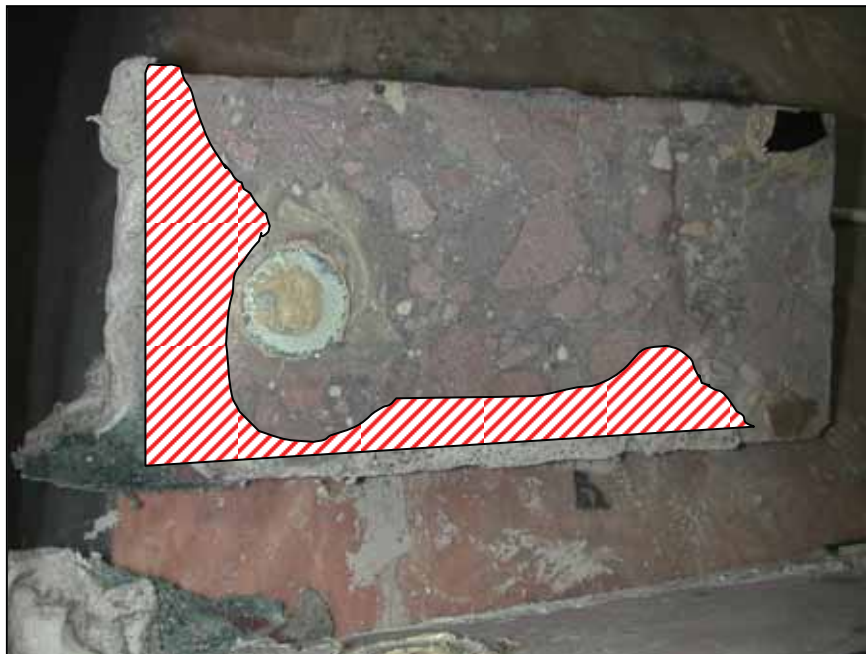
View of 6-mm ($\frac{1}{4}$ -in) wide crack test sample after filling with underwater mortar. Mortar is bonded to the vertical face of the specimen (left) and filled the crack to the limits shown.
